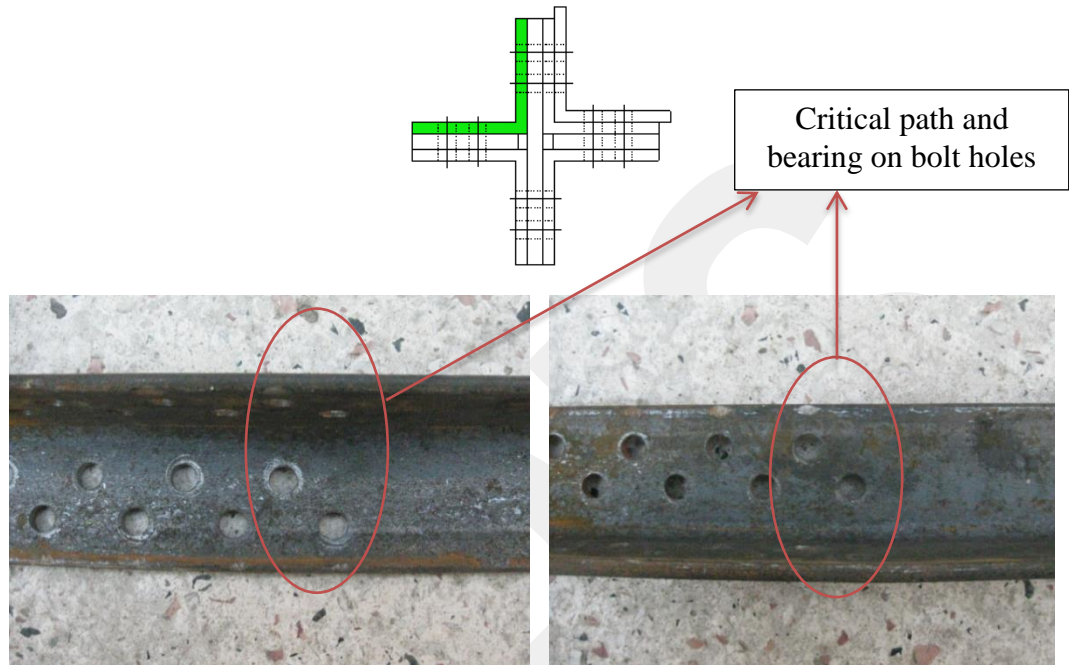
Bearing on lower main member 1 (Specimen-2)
